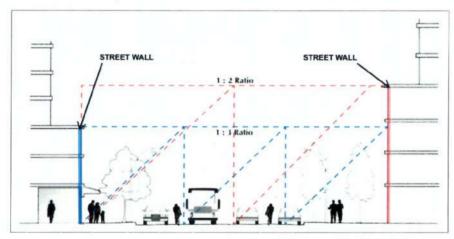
A building height-to-street-width ratio of between approximately 1:3 and 1:2 is recommended to frame streets and provide human scale. Portions of buildings above the street wall are encouraged to step back.
